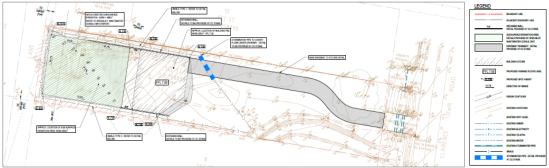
Civil plans (swales and retaining walls directing flows to Jackass Creek and Clarence Town Road)
